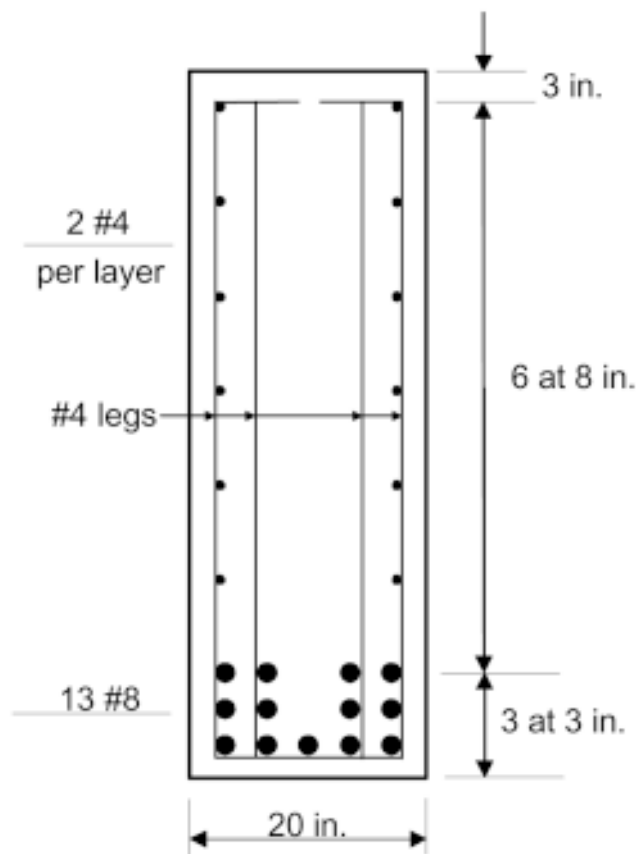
Beam section showing the horizontal steel to satisfy the skin reinforcement requirement (1 in. = 25.4 mm)
